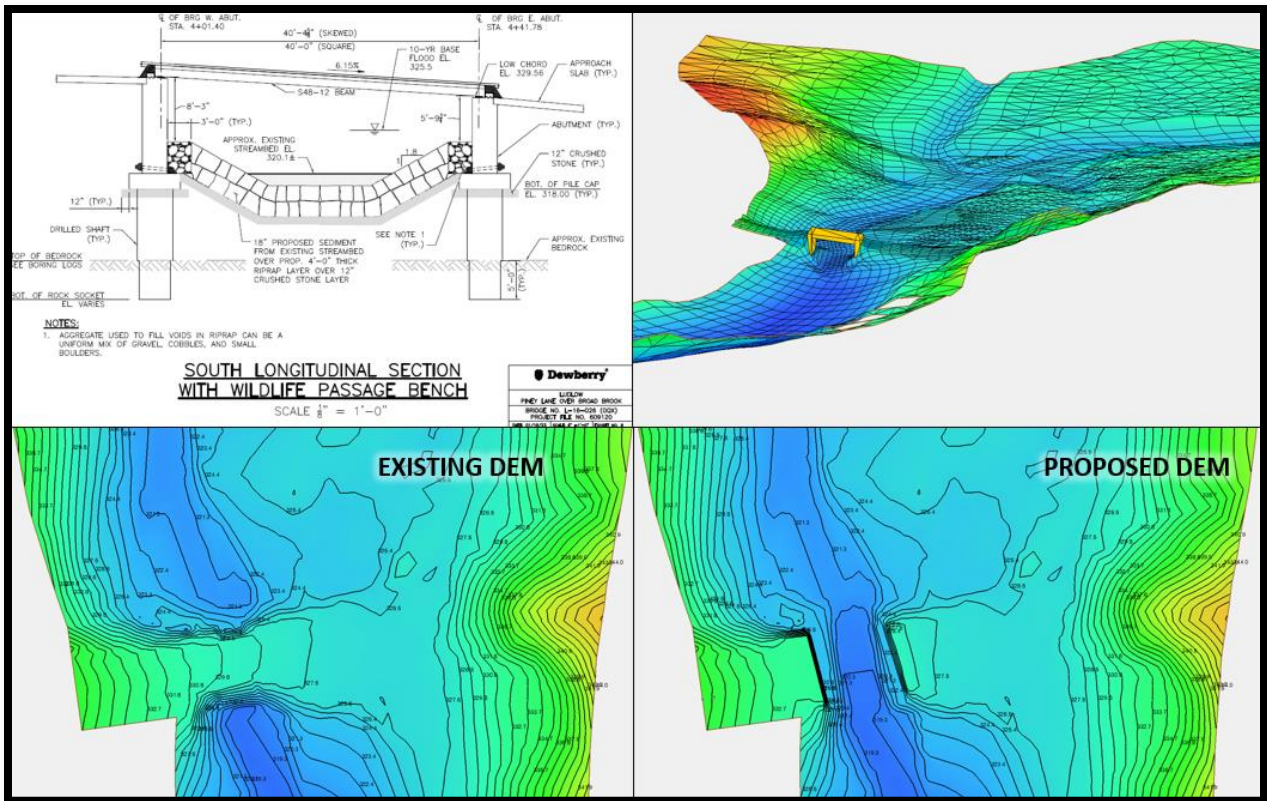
Proposed Bridge and DEM modification at the bridge
